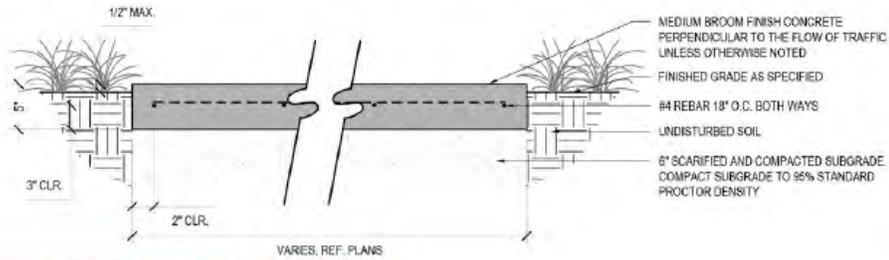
, Typical Trail Pavement Section (Source: Norris Design)
